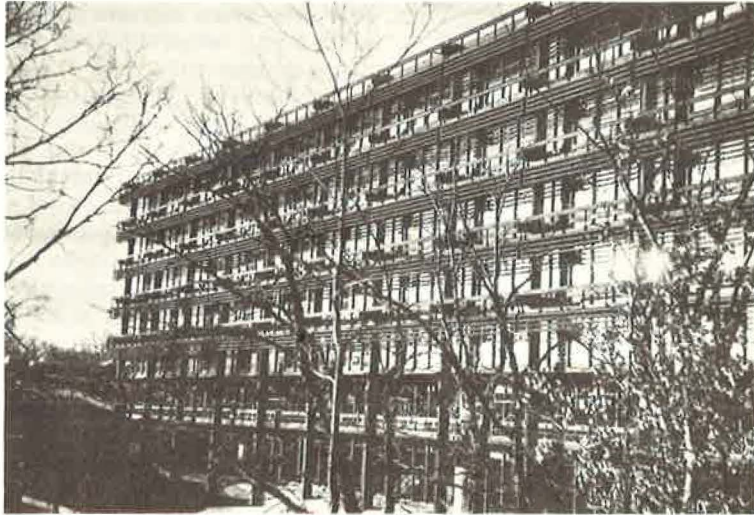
Exterior structural features of Deere and Company administration building, Moline, Ill.
